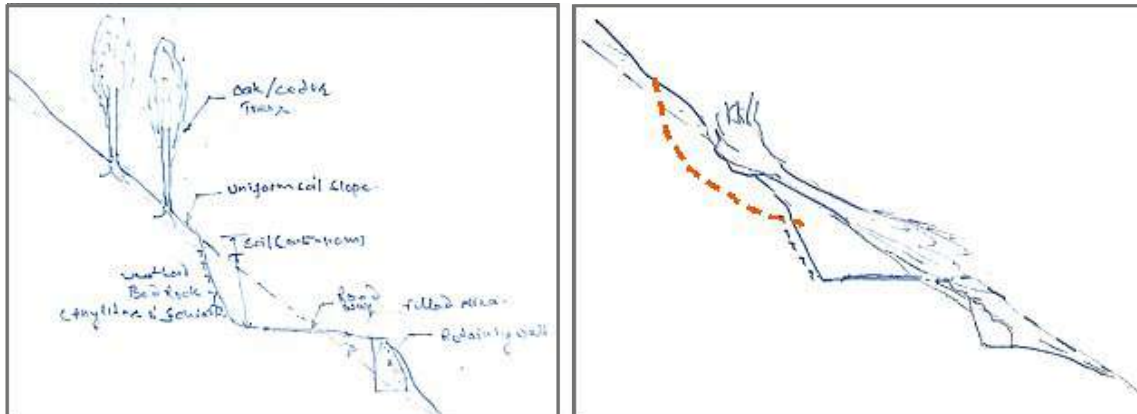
(Left) Typical X-section view and (right) tree uprooting and damage to the road
